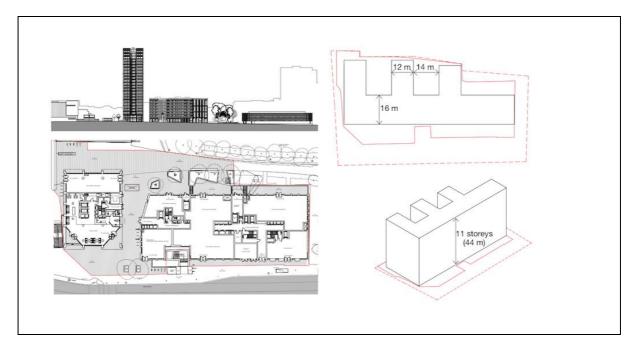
(left) Grid Architects' proposal for 100 Avenue Road, London, and (right) an alternative arrangement of the same floor area on the same site.
